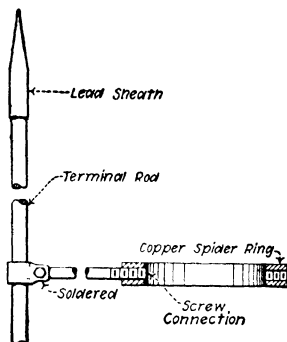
Details of copper spider, showing attachment to terminal rod.
